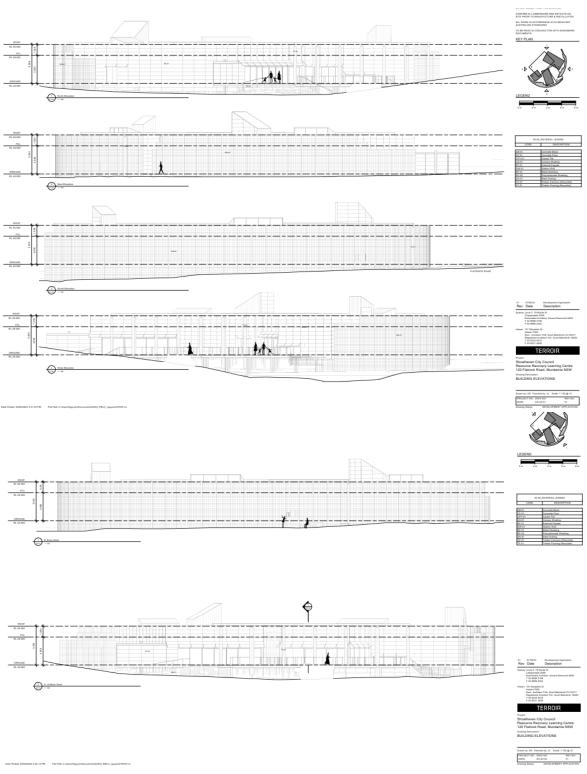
Elevation Plans of proposed learning centre prepared by Terroir
